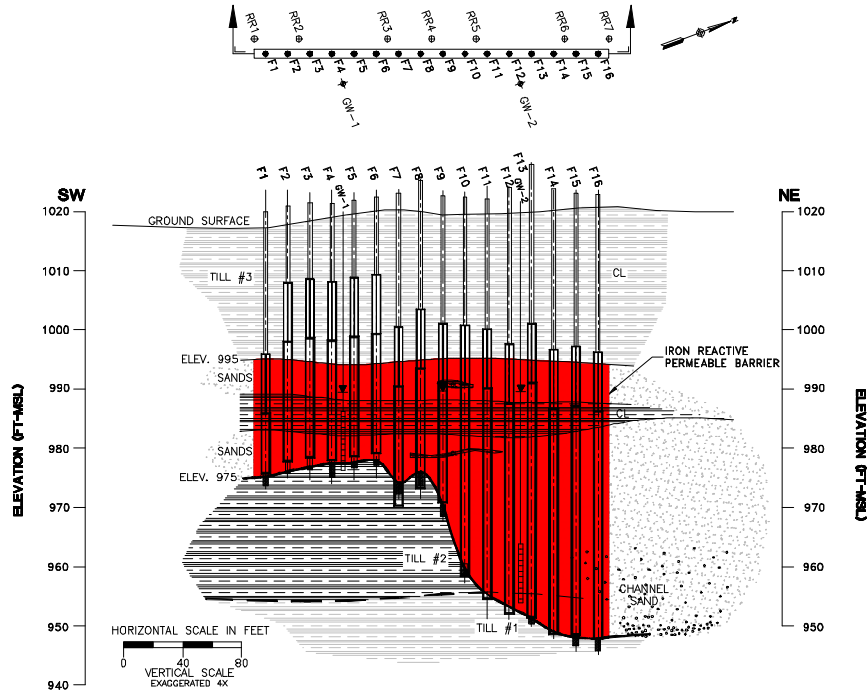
Plan & Sectional View of Iron Permeable Reactive Barrier.
